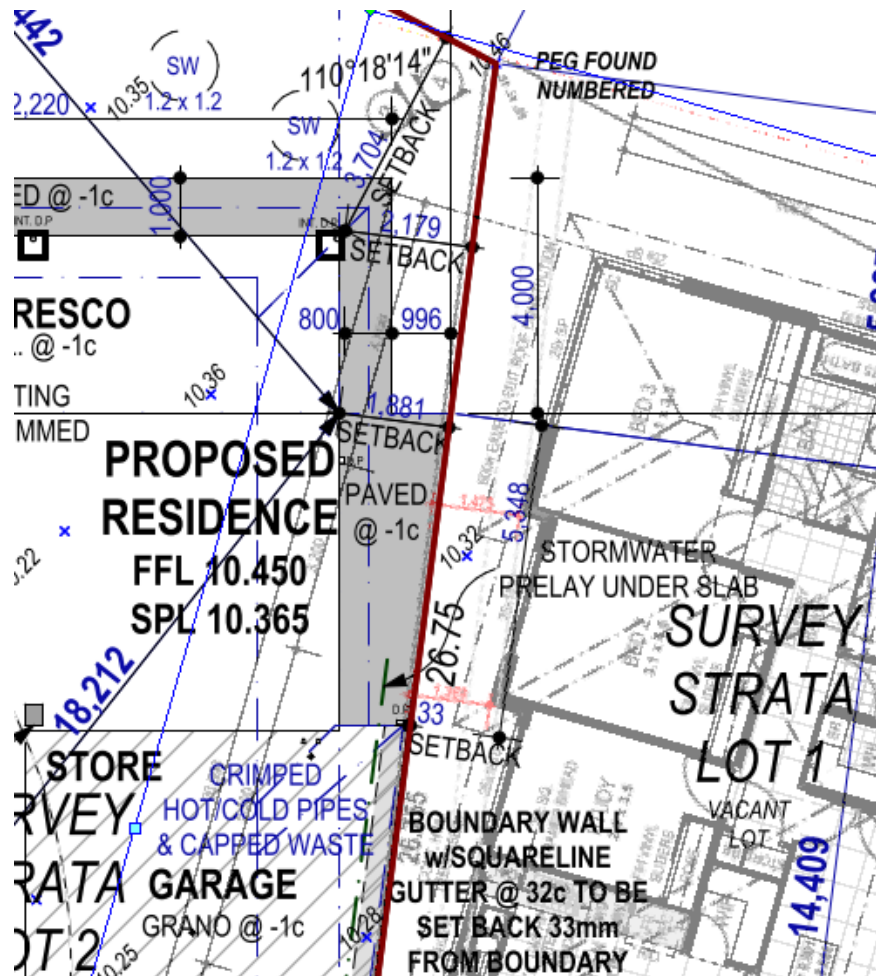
Living room wall of subject site on left in relation to adjoining lots approved single house on the right.
